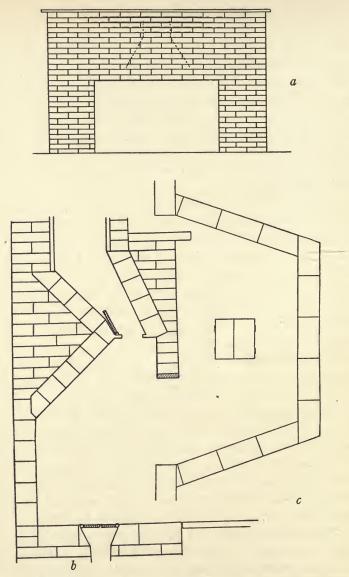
A fireplace: (a) face; (b) vertical section showing plan; (c) floor plan
